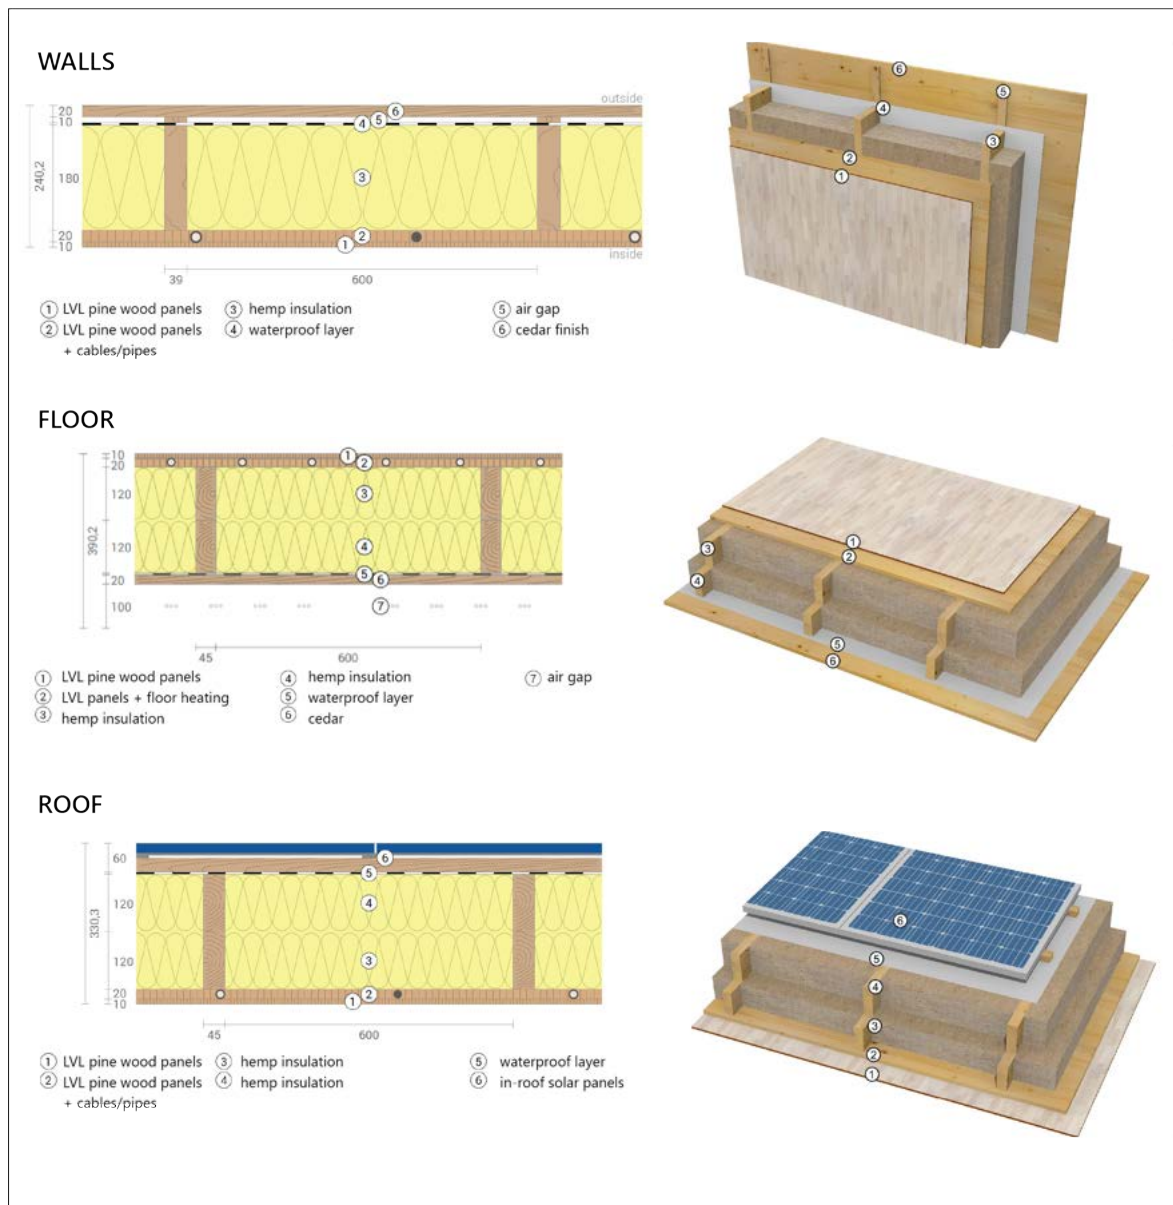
cross section of the wall, floor and roof (created with ubakus.com)
